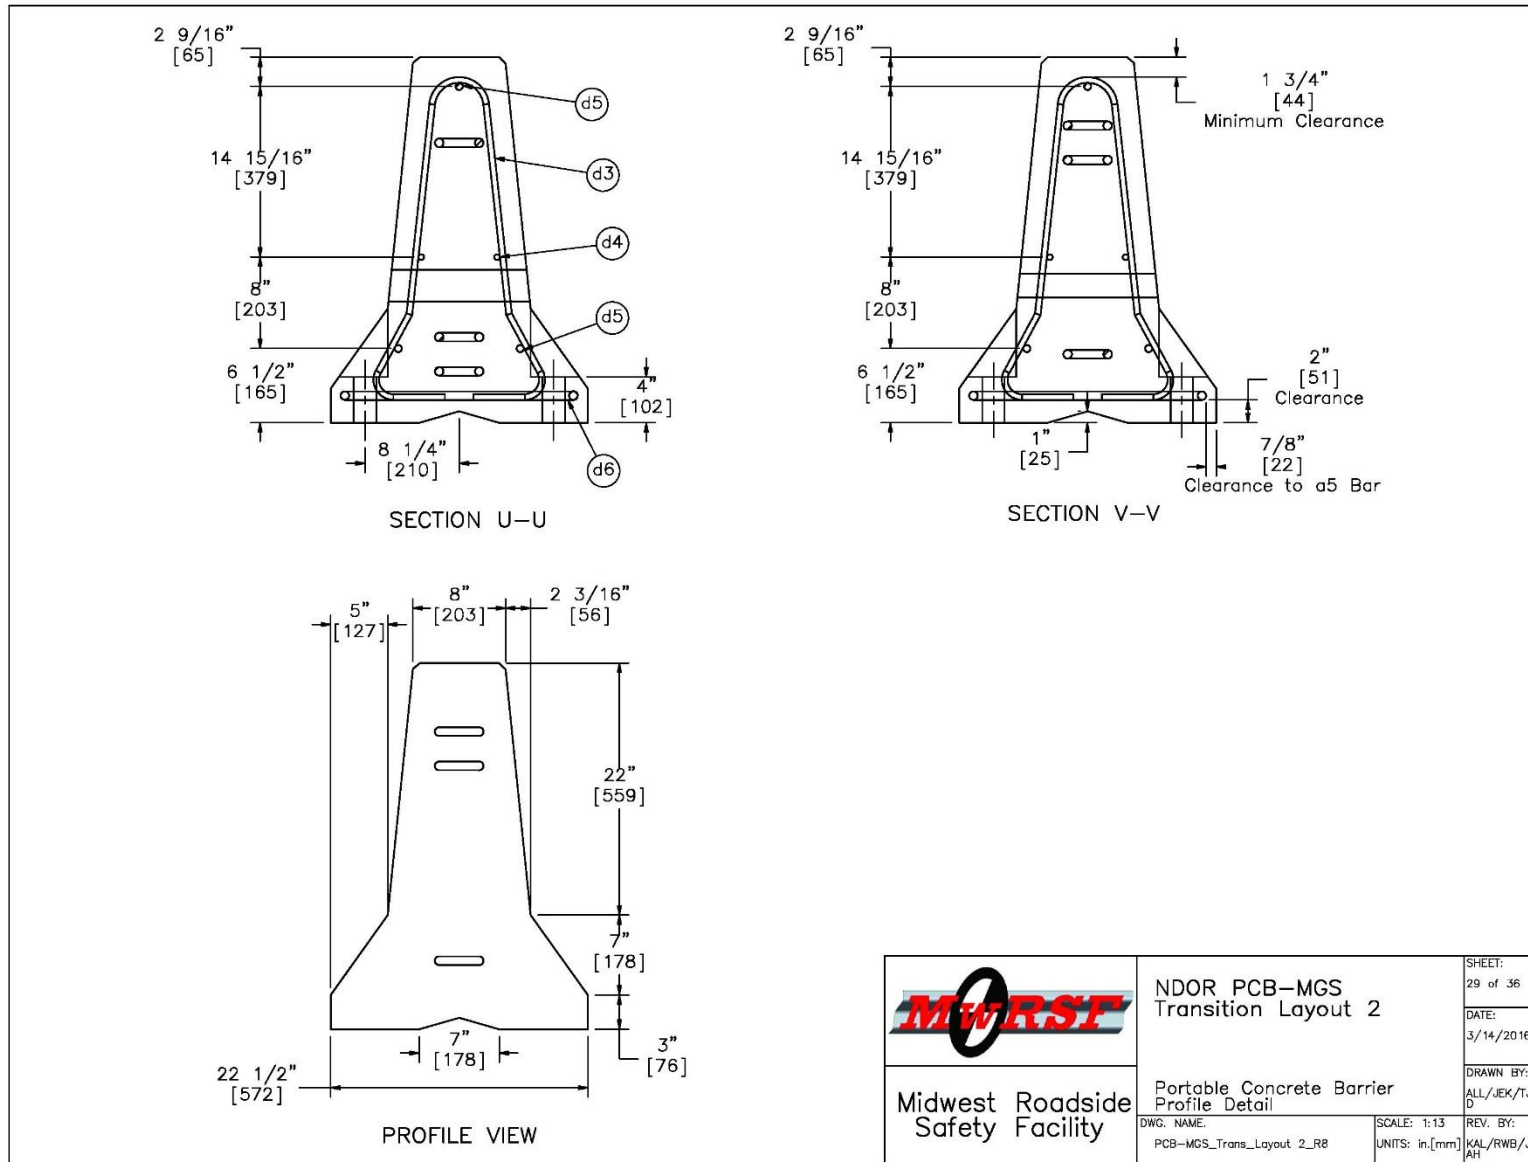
Portable Concrete Barrier Profile Detail, Test No. MGSPCB-1
